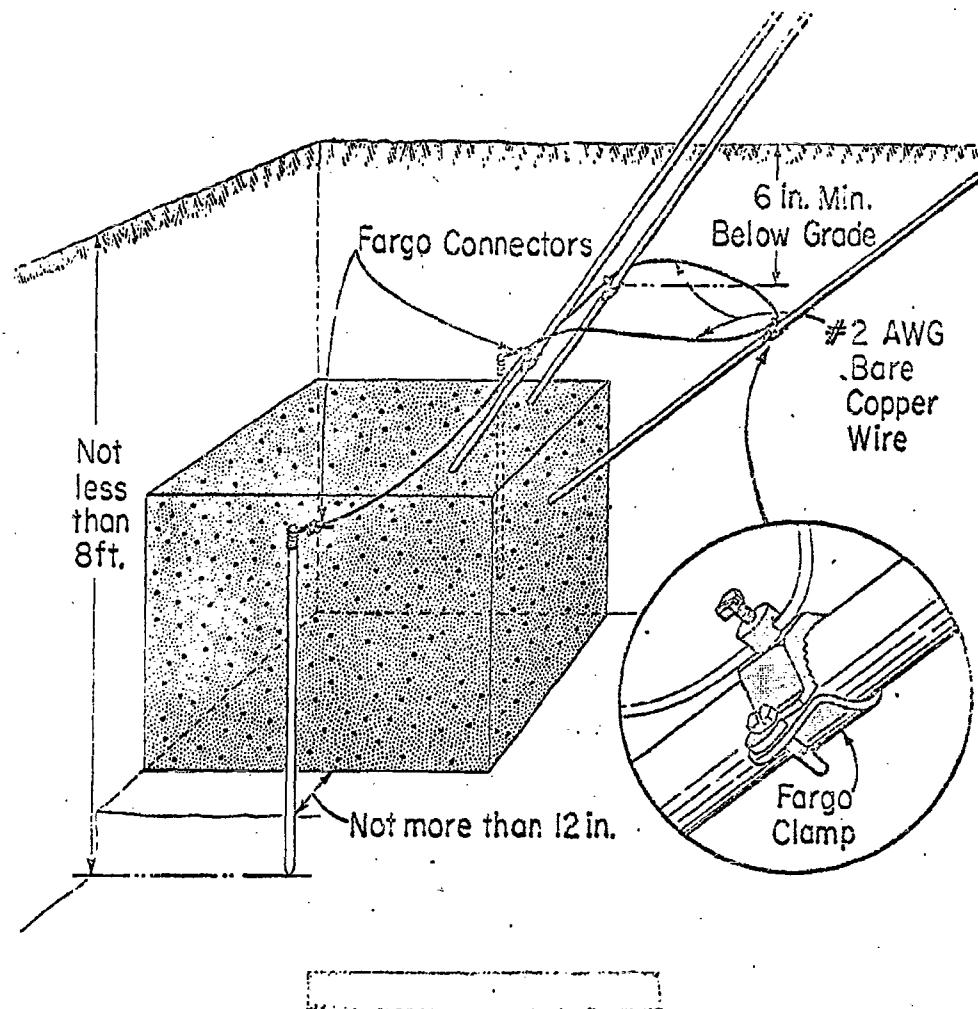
GROUNDING AT ANCHOR OF GUYED TOWER.
